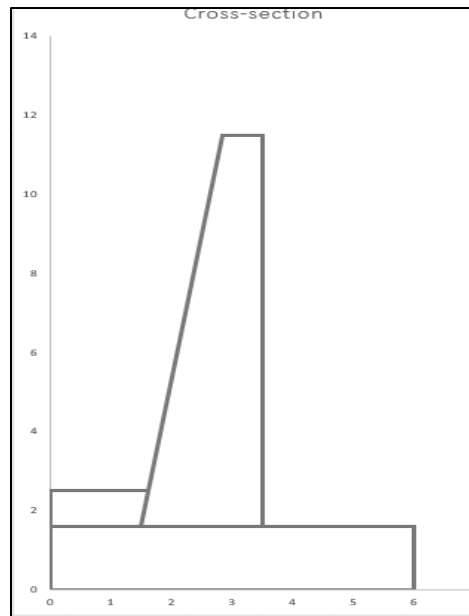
X-section view of Cantilever Retaining wall from Excel VBA
